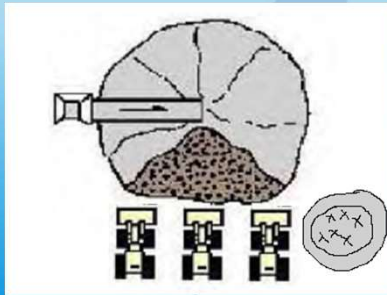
Top View Sample Pattern "Mini" Stockpile after Back Blading
